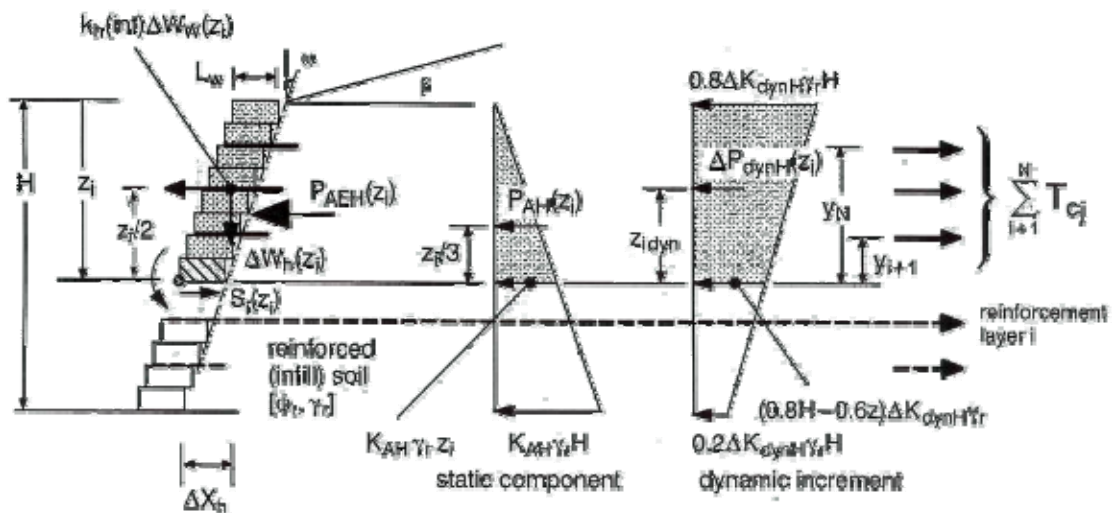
Geometry and forces used to calculate interface shear (bulging) and overturning of the facing column for reinforced SRW structures [17]
